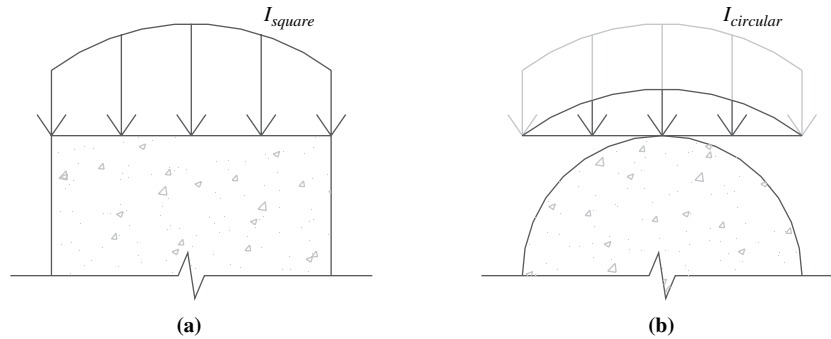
Relative net impulse on column cross-section: a) square column, b) circular column.
